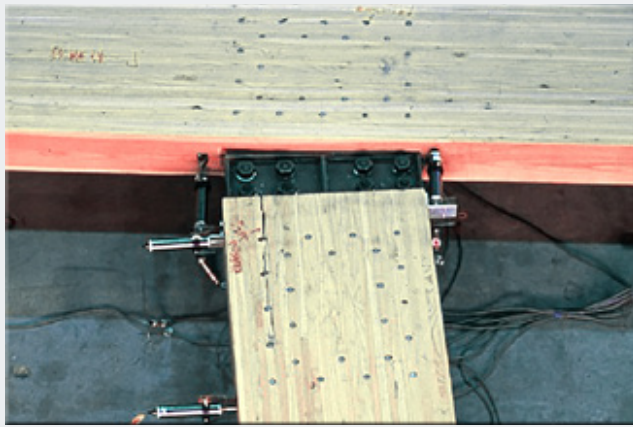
Splitting in moment resisting beam-column joint connection (source unknown).
